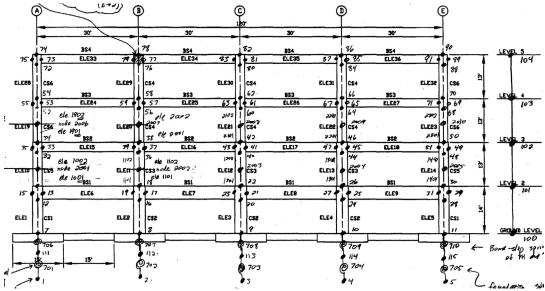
Special Moment-Resisting 4-Story Concrete Frame Building Model (Haselton et al., 2006a)
